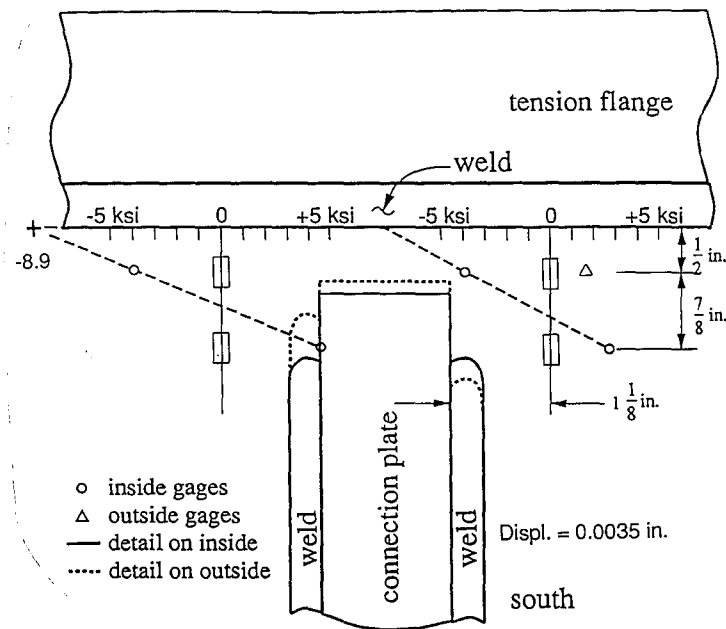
Static Stress Distribution on Inside Girder at Pier S7-5 (84 in. Girder) Before Retrofit with Dump Truck in Outside Lane (Worst Case)
